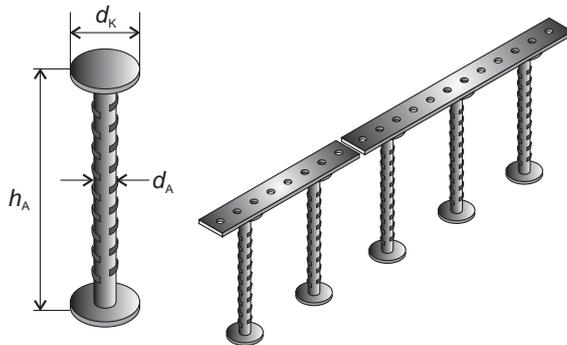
Double headed stud with steel rails welded to the heads
